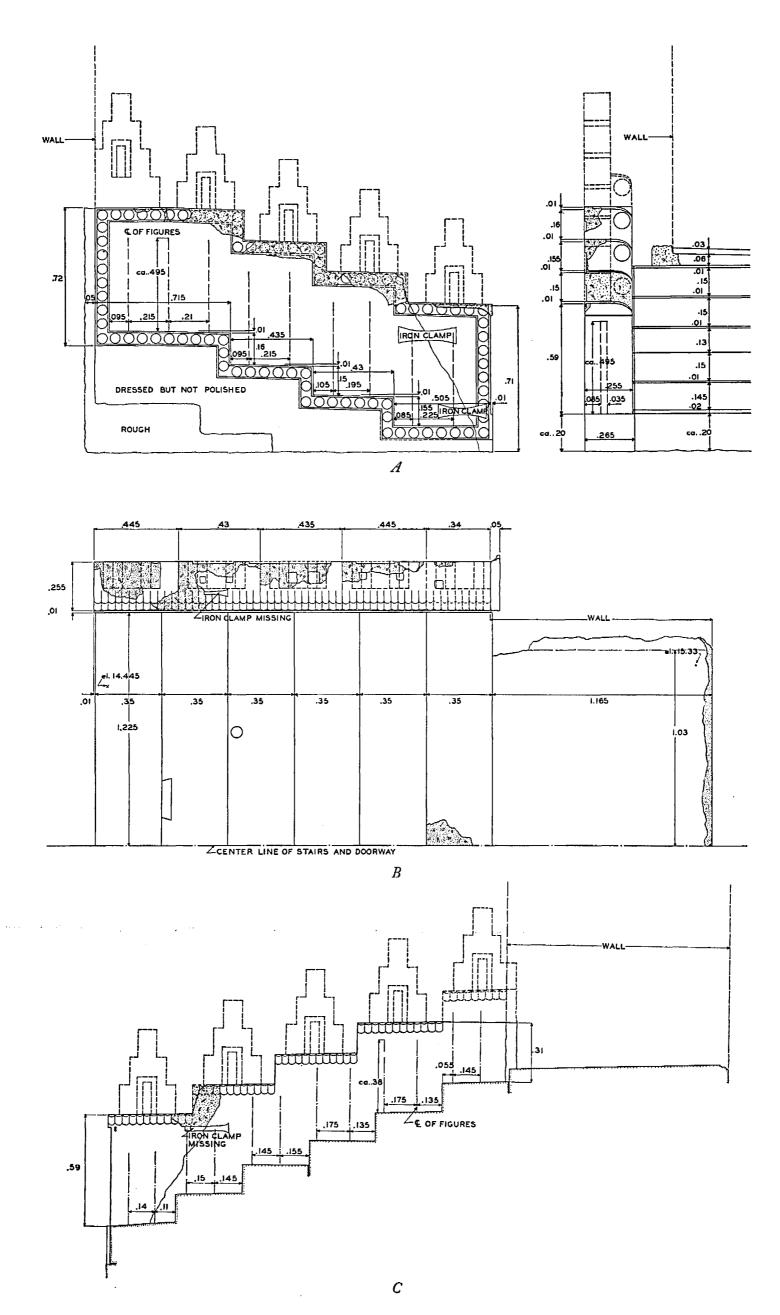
Council Hall. Southern Stairway. Scale, 1:20. Reconstructions in Broken Lines. A. Elevation of Eastern Façade and Stairs.
